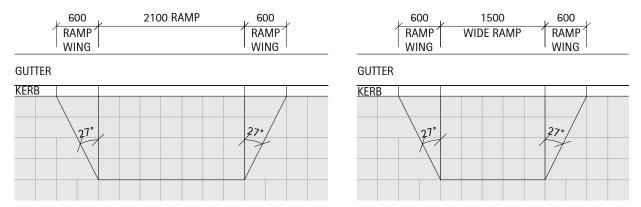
Ramp Wings when Ramp Aligned to Face of Kerb
